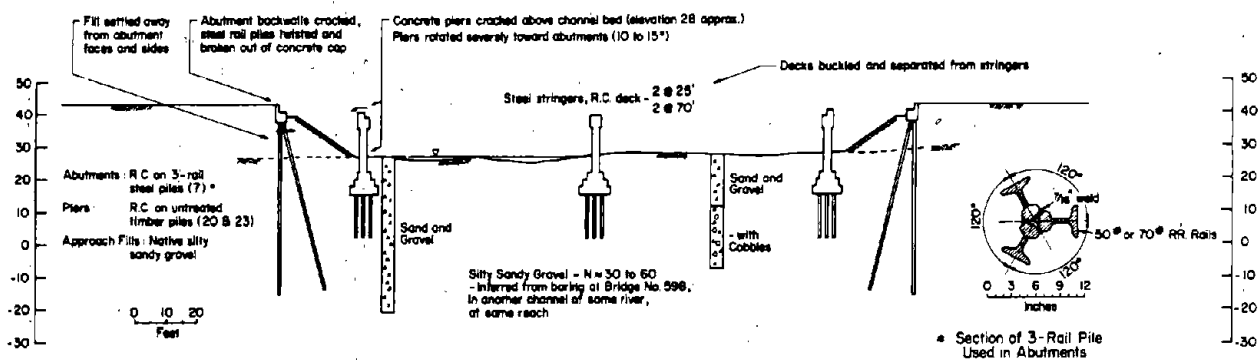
Bridge 596: Resurrection River (centerline section looking upstream - natural scale).
